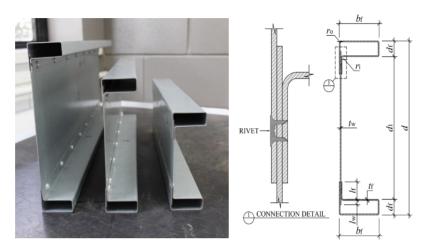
Rivet Fastened Rectangular Hollow Flange Channel Beam
